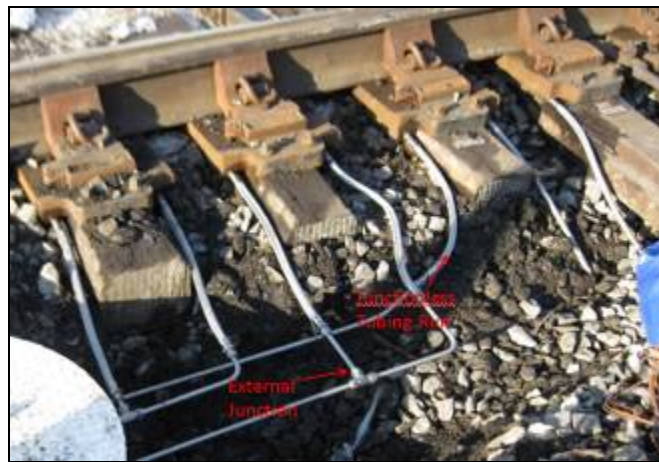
Well 2 Crossover Tubing Configuration to Switch Plates South Side
